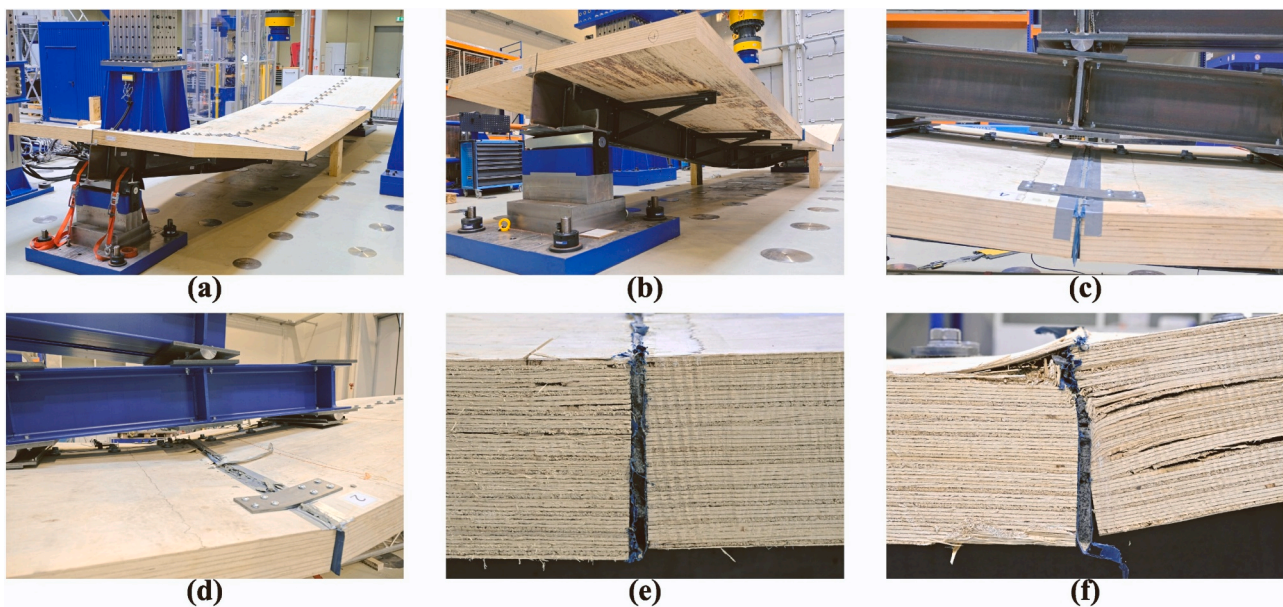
Pictures taken after the test: (a) beam specimen from top; (b) beam specimen from below; (c) undamaged panel-to-panel gap of BT-1; (d) damaged panel-to-panel gap of BT-2; (e) cutting of undamaged gap; (f) cutting of damaged gap.
